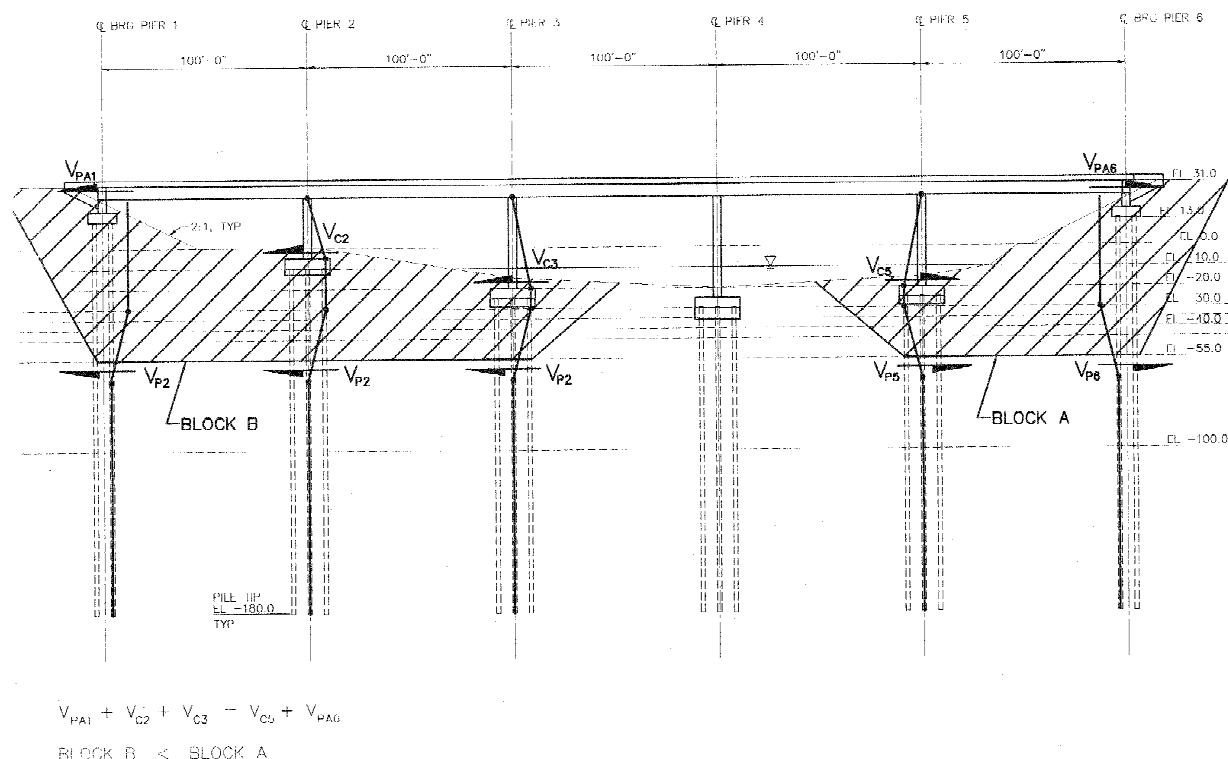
Forces Provided by Bridge and Foundation Piling for Resisting Lateral Spreading
